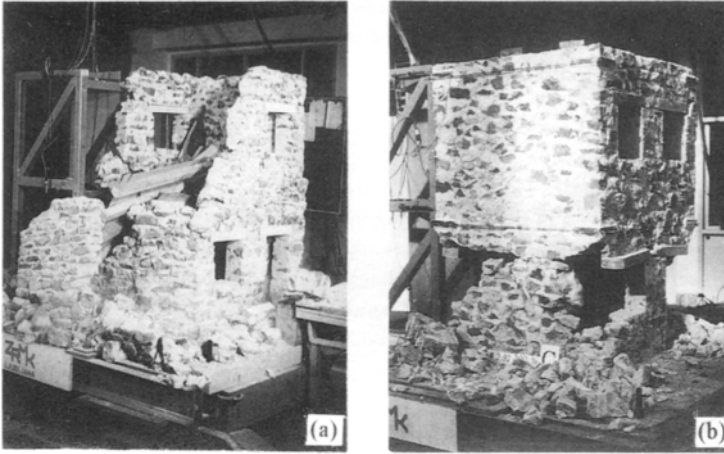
Mechanism of collapse of stone-masonry model without (a) and with steel ties at floor levels (b).
